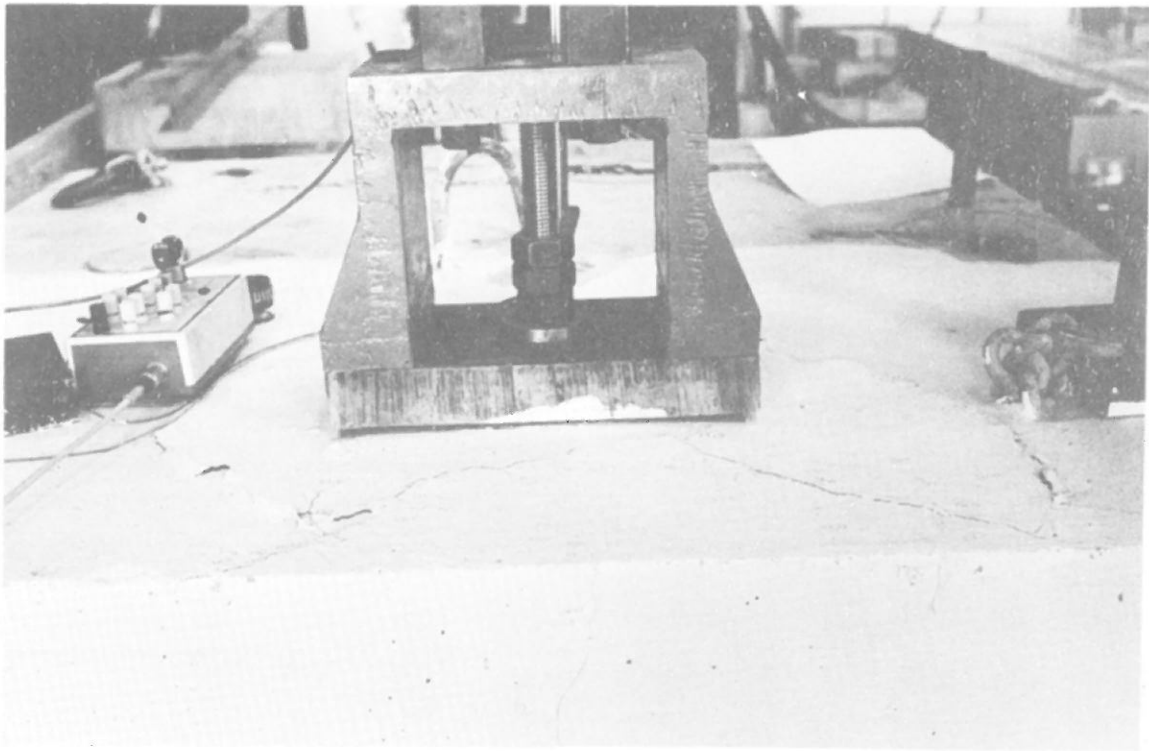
Anchor bolt SD 3:2 at failure. Drilled hole with 200 mm depth and 300 mm edge distance. Anchor bolt M30 with washer $\phi 105 \times 24$. Reinforcement $\phi 10$ Ks 400 # 200. Ultimate load 206 kN. The load is applied with a fixing aimed for prestressed bolts. However, this bolt was not prestressed
